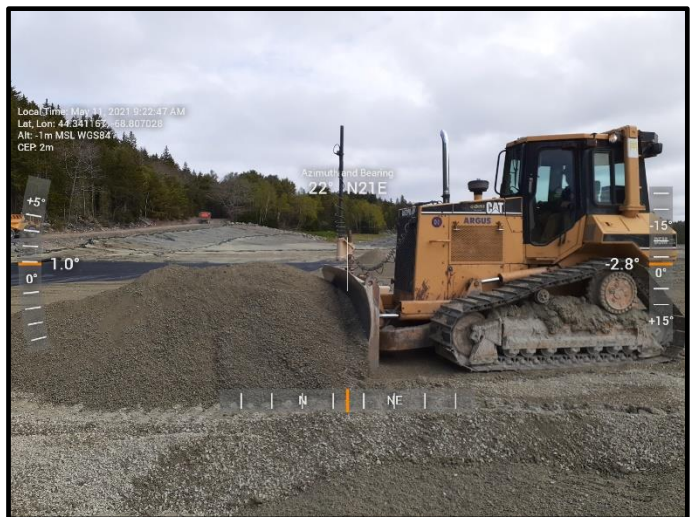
(group). Views of Southwest corner geo-grid and fines placement as surface stabilization.
